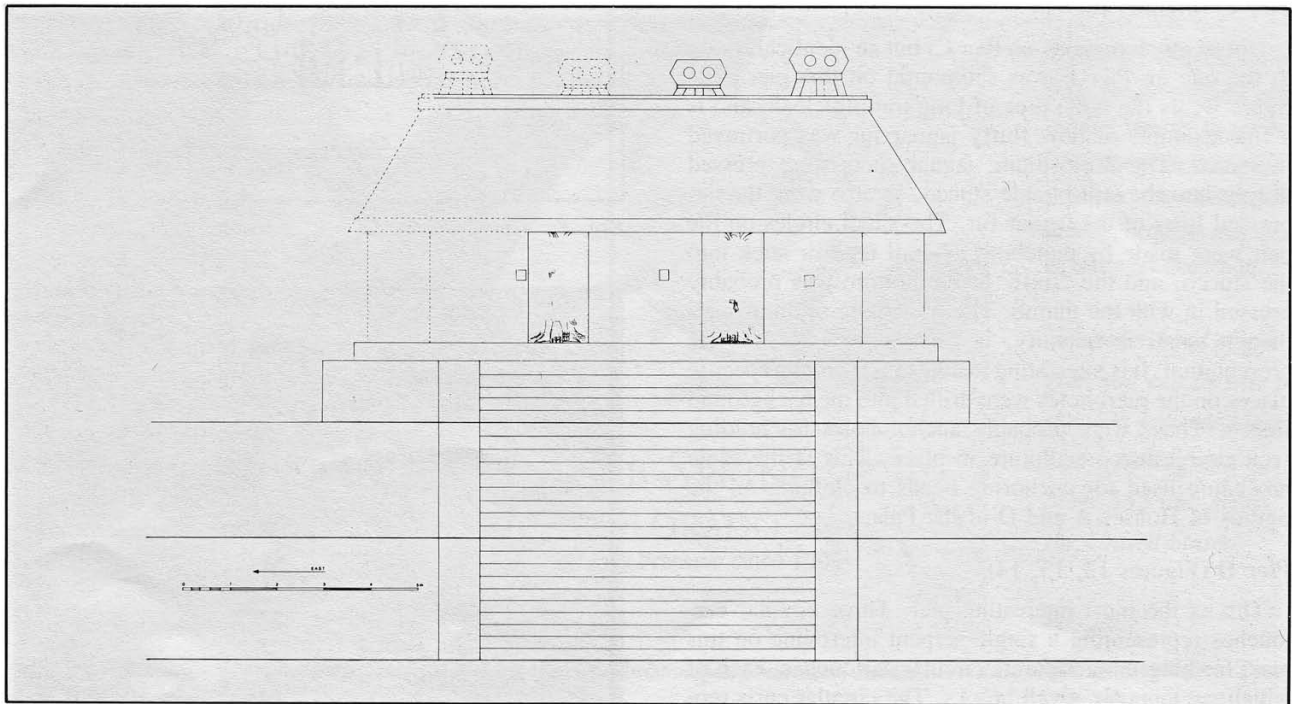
North façade of the Olvidado with partially reconstructed piers
